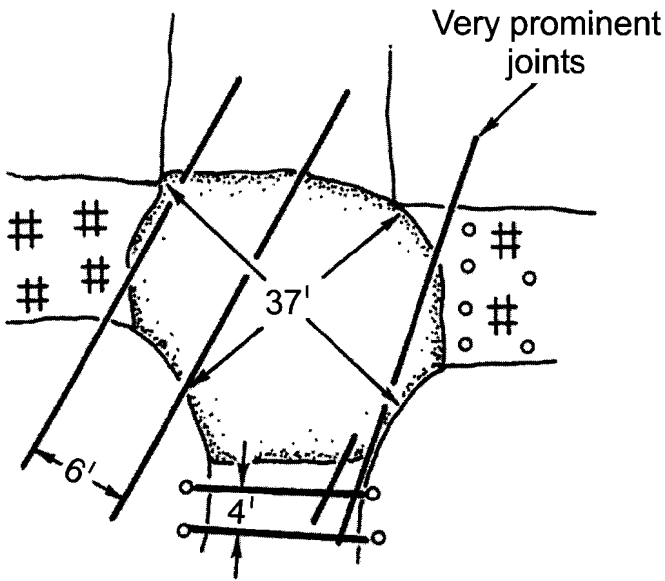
Roof fall caused by large joints spaced 6-10 ft and overspanned intersection.
